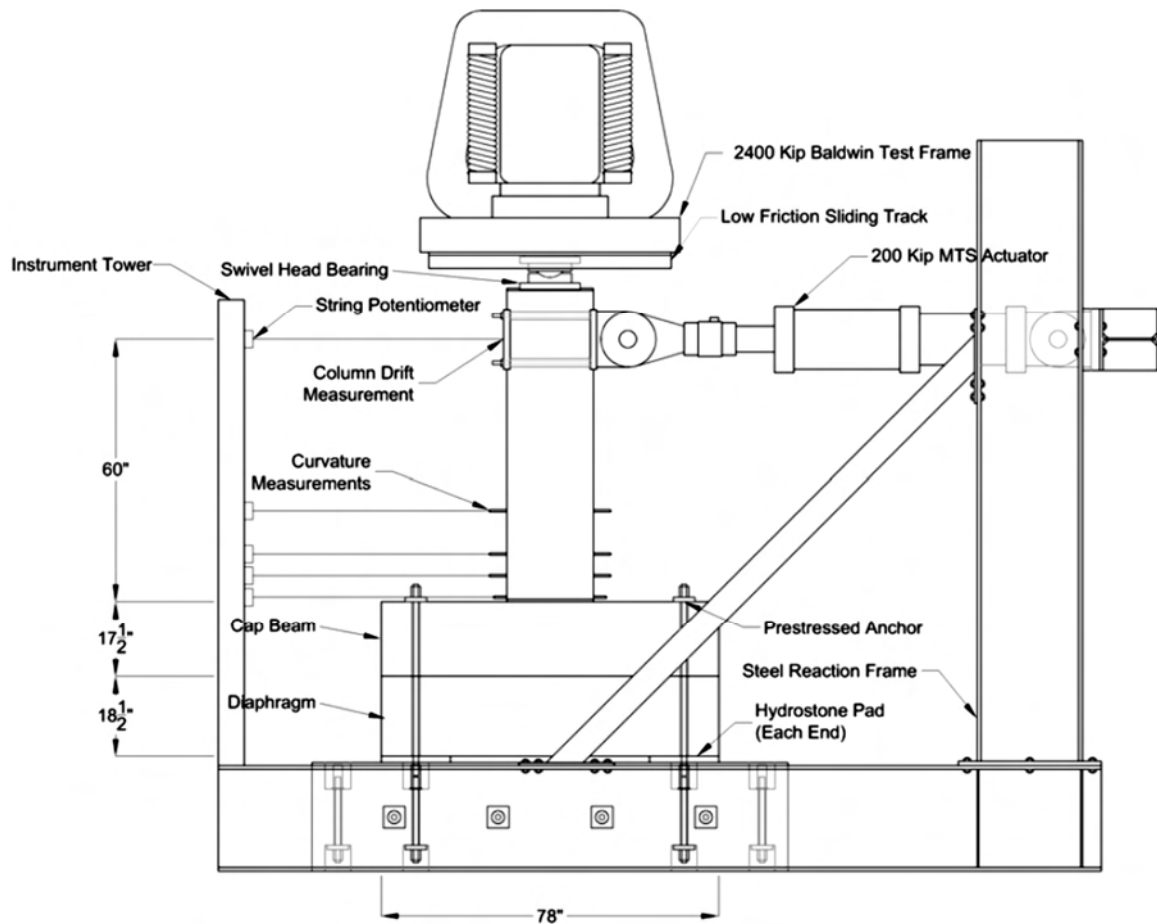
Grout-Filled Duct Column-Cap Beam Connection Test Setup (Pang et al., 2008)
